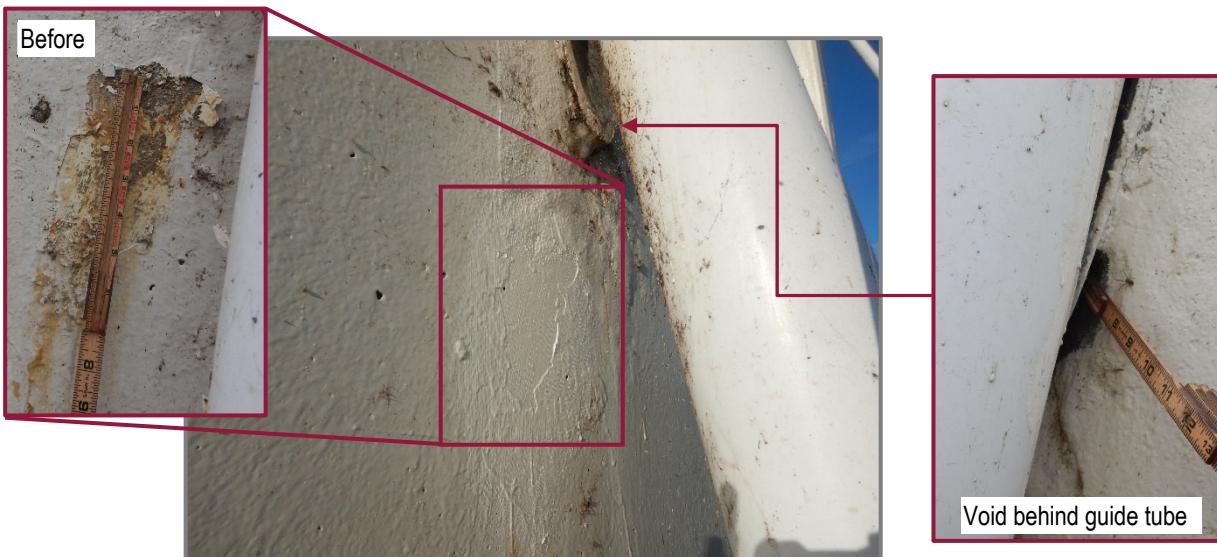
East leg of Tower 4 north face in Segment 12 near Cable B16E with area that was sealed (looking southwest). Also note the void along the bottom west side of the steel guide tube.
